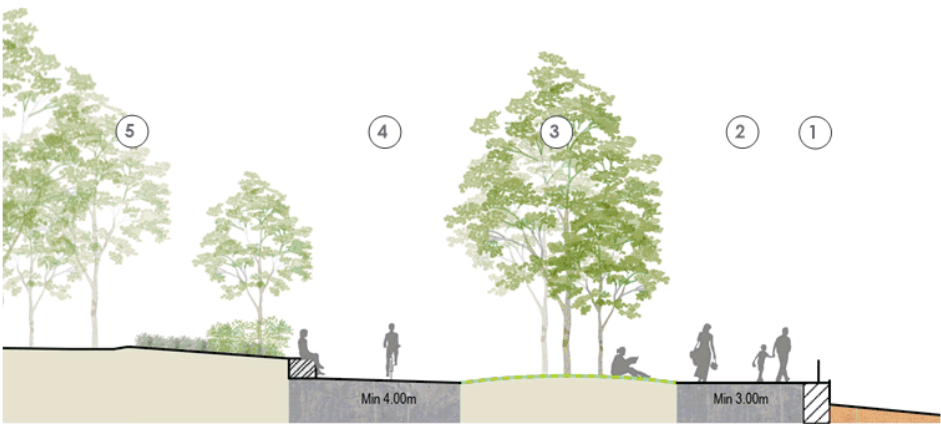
Section A – typical landscaped mound (Scale 1:200)
